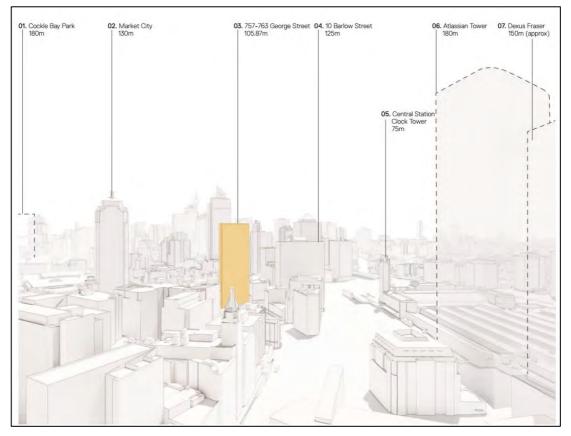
Proposal and Existing and Planning Towers Viewed Looking North Source: Grimshaw
